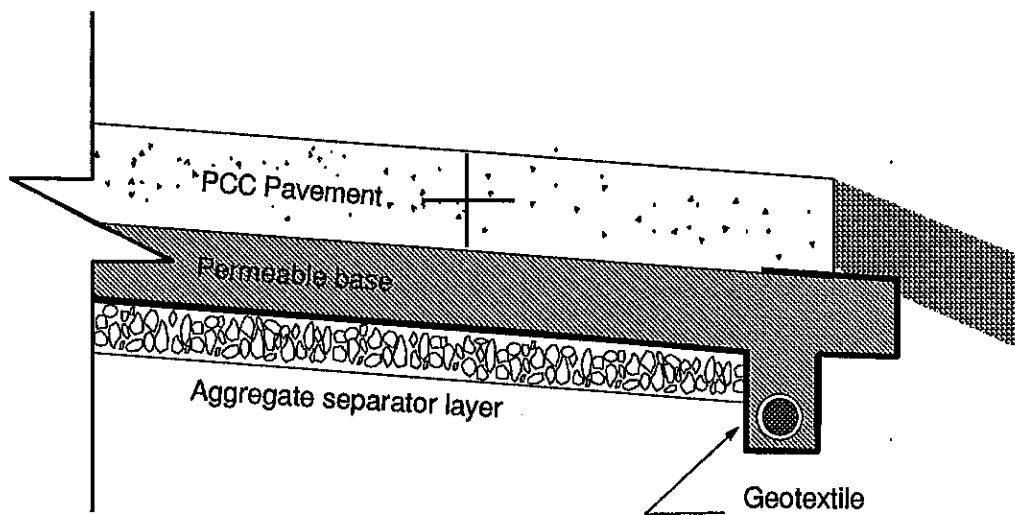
Recommended cross section of full subdrainage system for rigid pavement.
